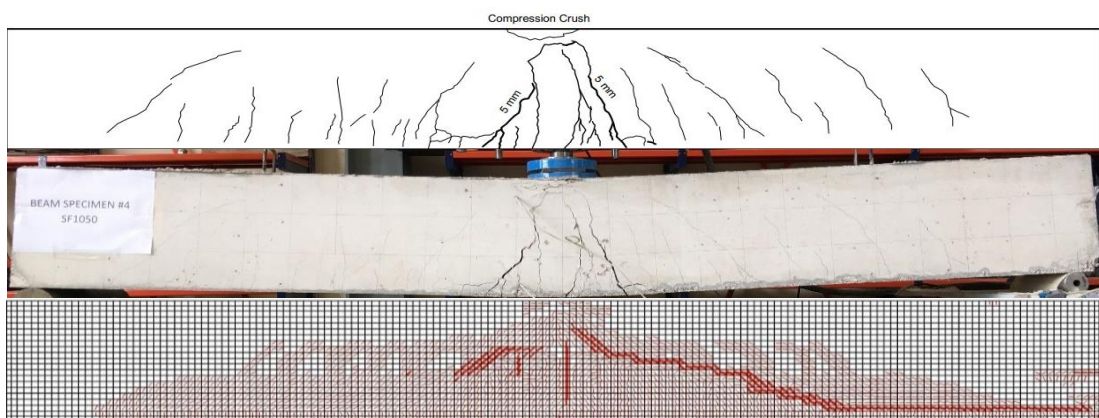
Experimentally and numerically obtained crack patterns of plain and fibrous concrete beams
